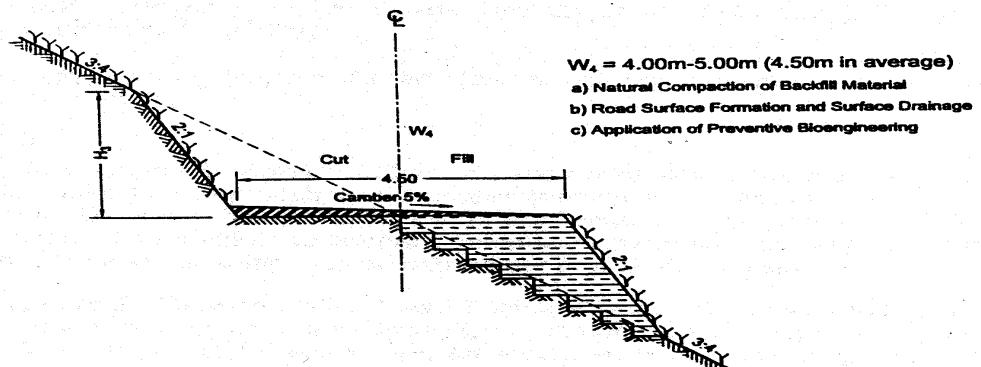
PHASE 4 - ROAD FINALISATION WORKS AND BIOENGINEERING
